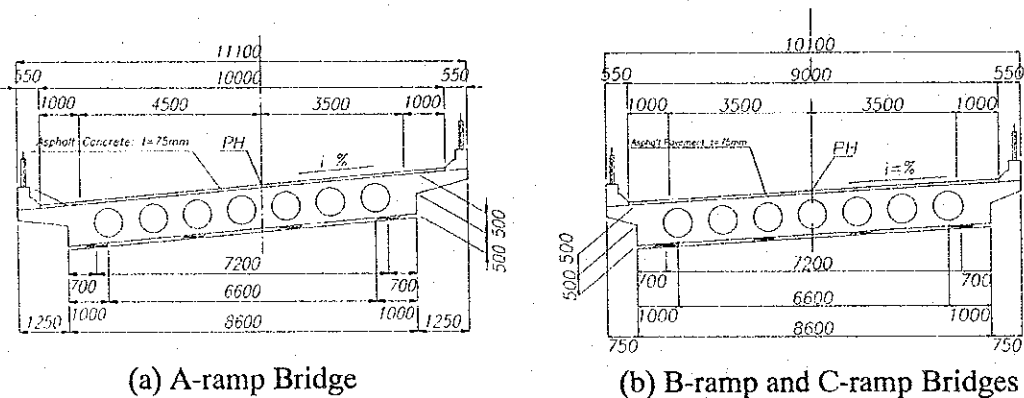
Typical Cross Sections of RC Hollow Slabs of Ramp Bridges
